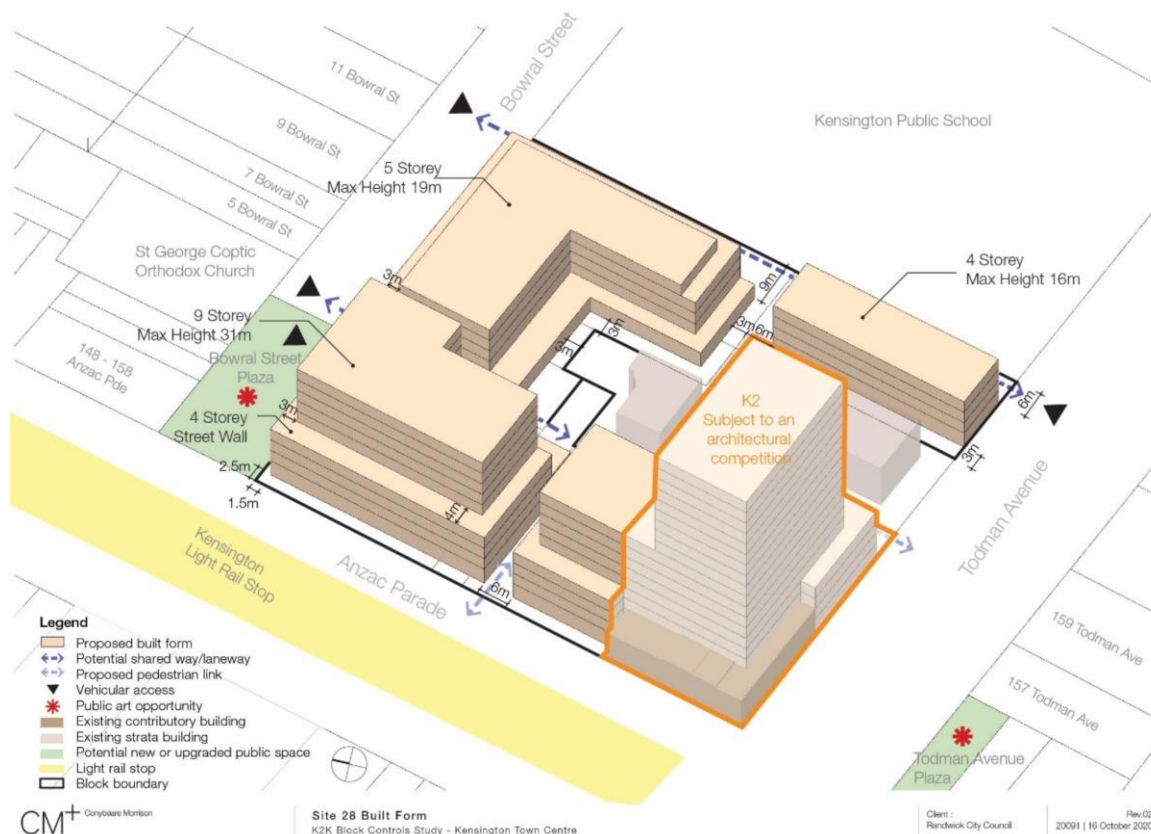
Site 28 Built Form Plan (Source: K2K DCP)
